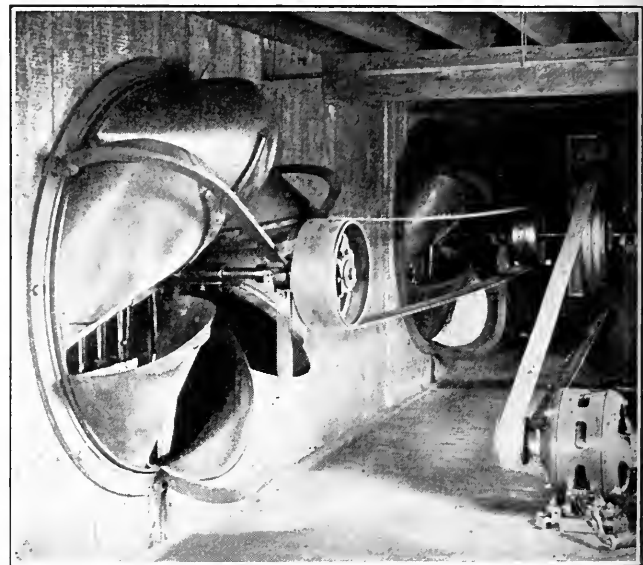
LARGE EXHAUST FANS DRIVEN BY HIGH-SPEED MOTOR
